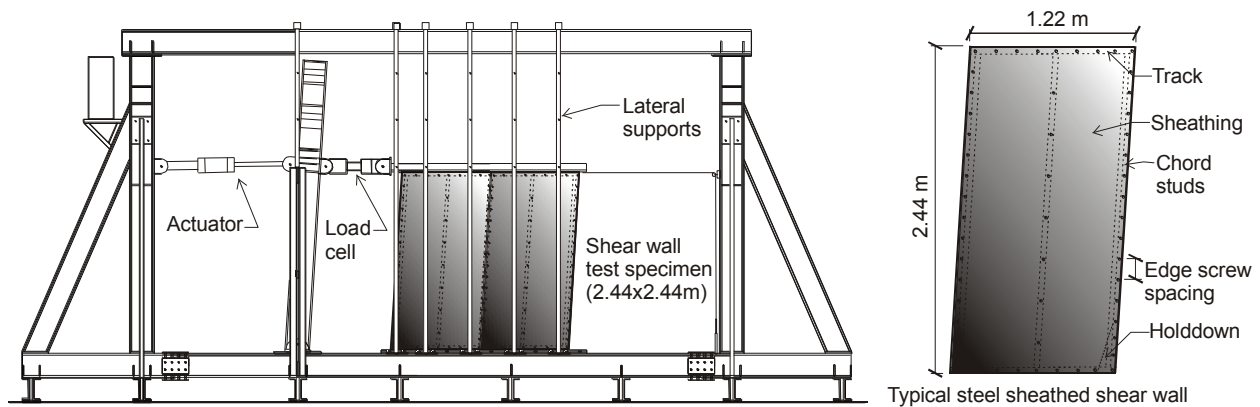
Schematic drawing of test frame and steel sheathed shear wall.
